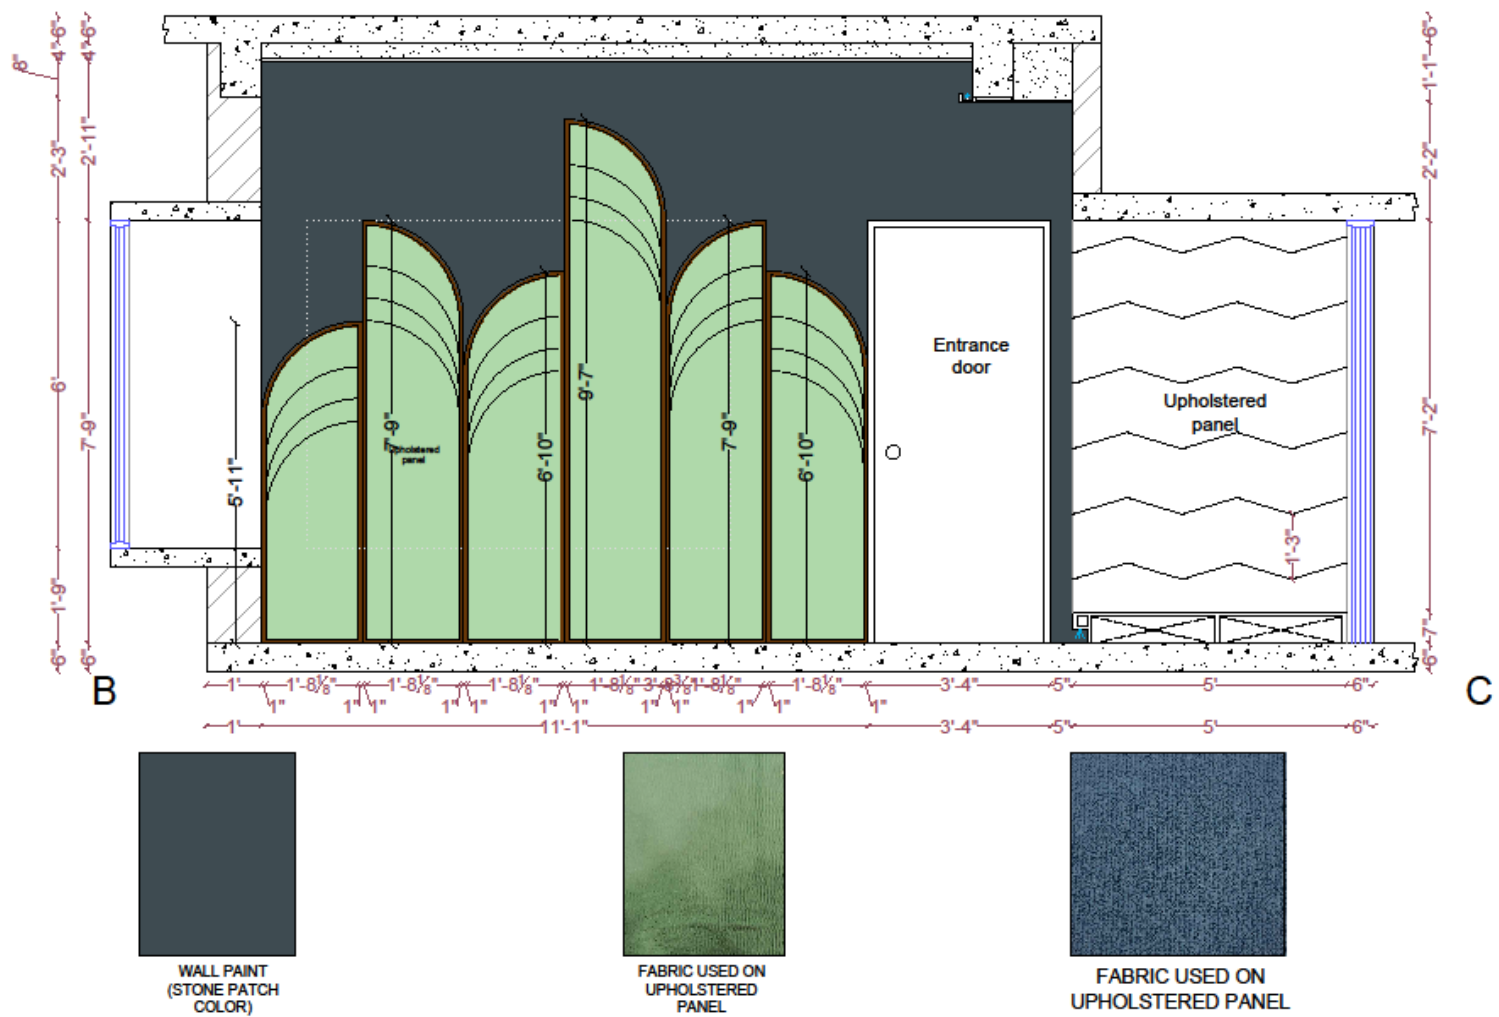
PROPOSED WALL ELEVATION BC (option -3)
